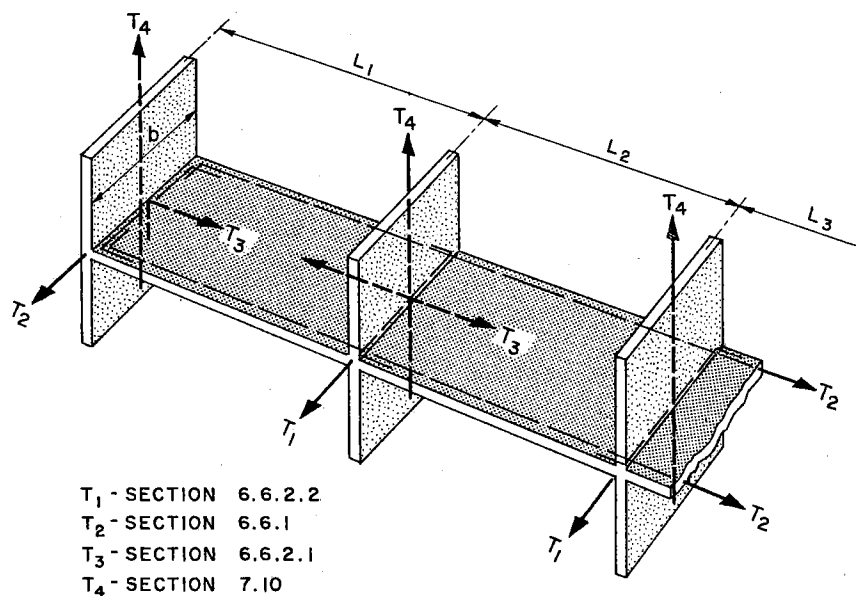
Recommended tie forces in precast concrete bearing wall buildings.
